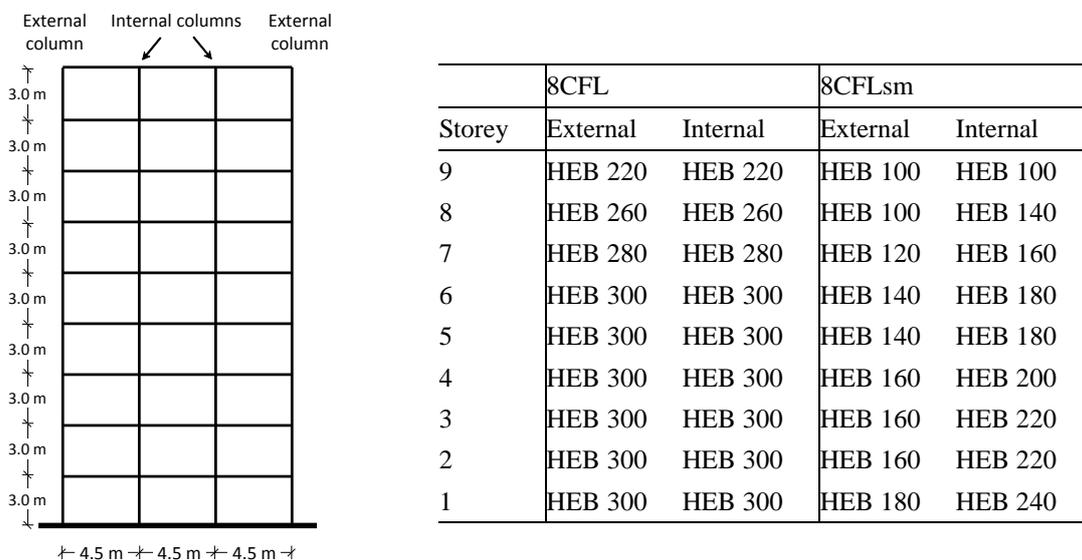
Geometrical scheme and column cross-sections of the 8CFL and 8CFLsm frames.
